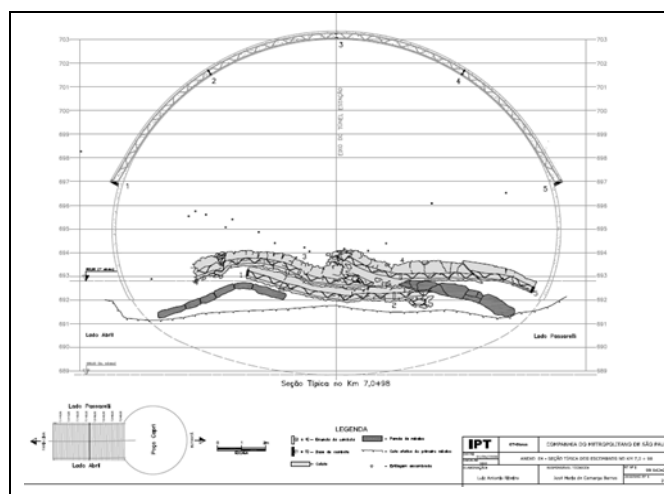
Some examples of the failed arch and wall support, as revealed at the bottom of the 20 x 20 x 40 m approx. of excavation through fallen soil, saprolite and jointed rock. Despite all this careful recording, the ridge-of-rock elevation discrepancy in relation to borehole evidence was ignored. IPT, 2008.
